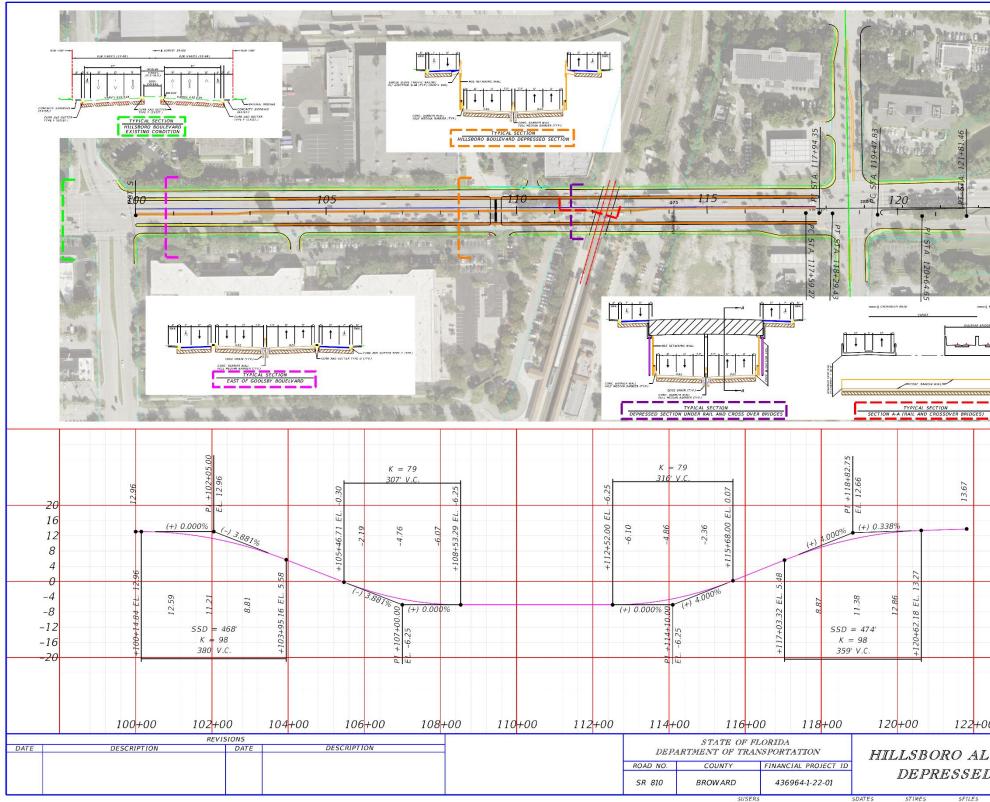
Hillsboro Boulevard – Concept Plan – Alternative 1
